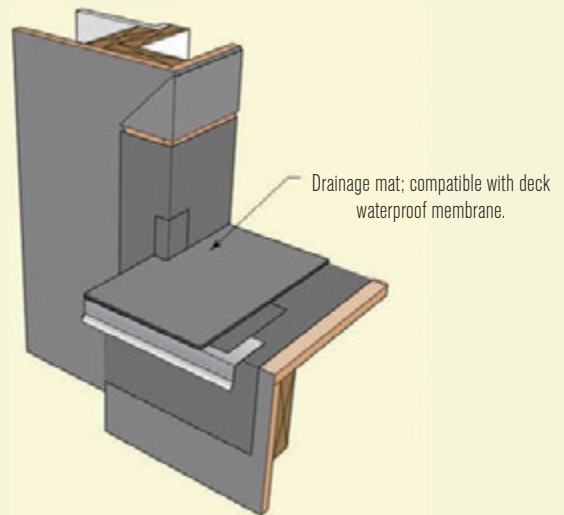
The figures are drawn with a concrete traffic surface installed over a waterproofing layer and drainage mat.
